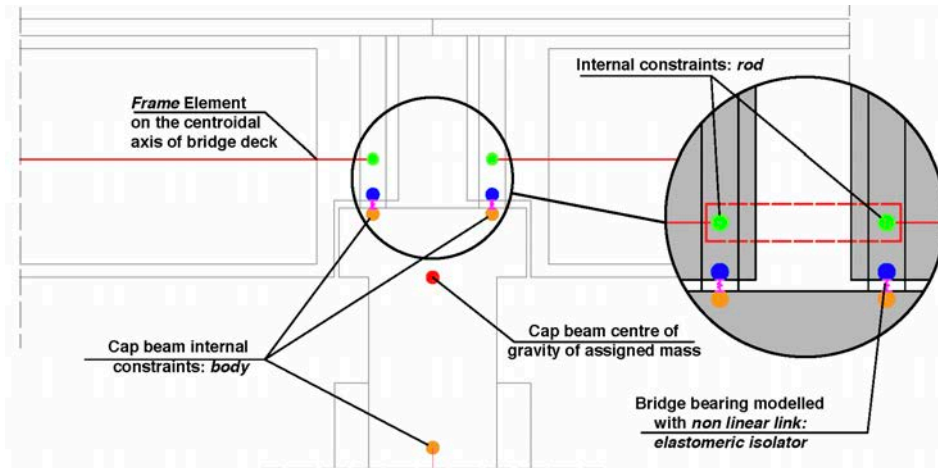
Modelling of the superstructure, span connected with longitudinal chains.
